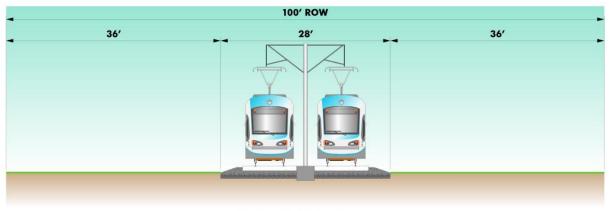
Enhanced Streetcar Typical Section - Rock Island Railroad Existing Conditions
